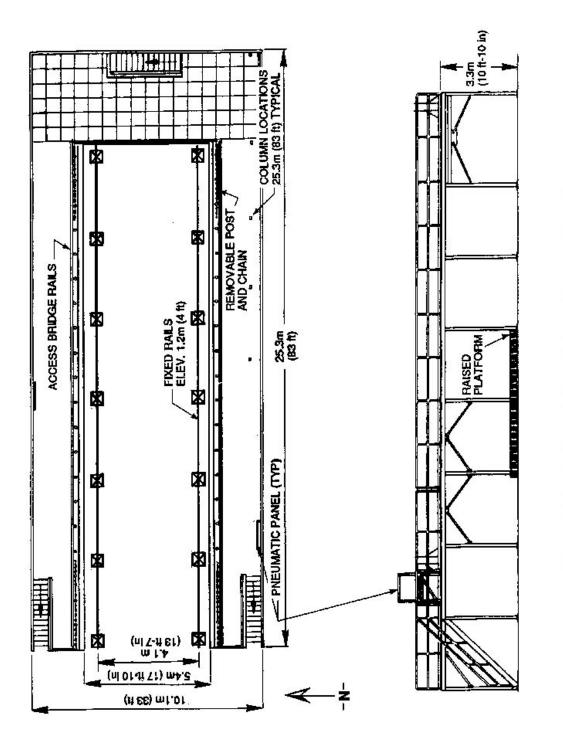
Workstands 2 and 3, Plan View and Elevation
